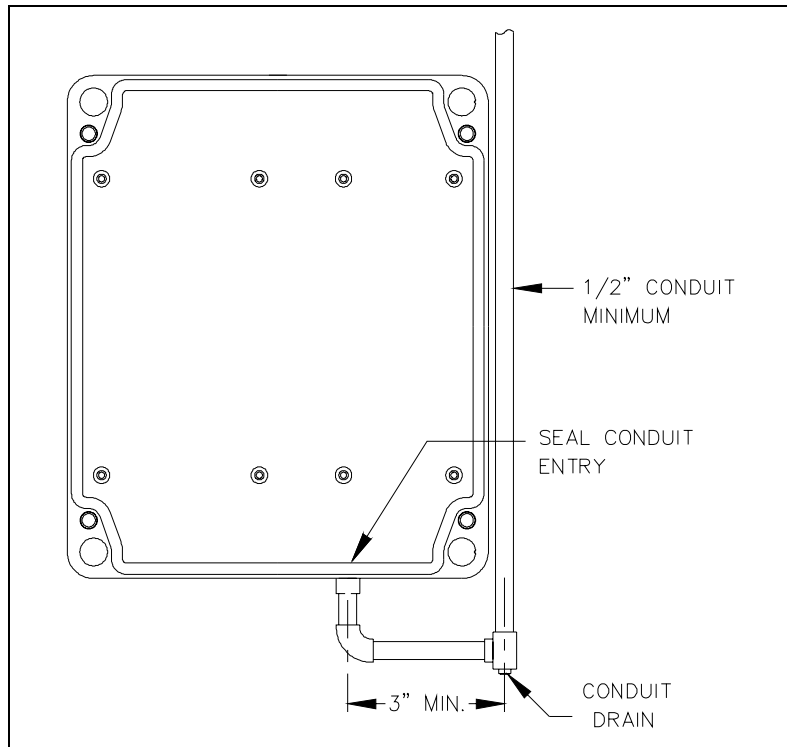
Bottom entry conduit installation details recommended for non-metallic enclosures
